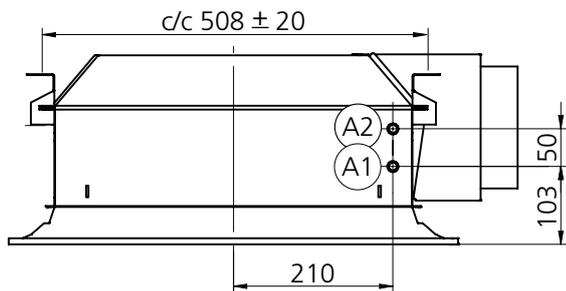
Dimensional drawing, end-view with water connections. Air connection on the long side - pos 2.
